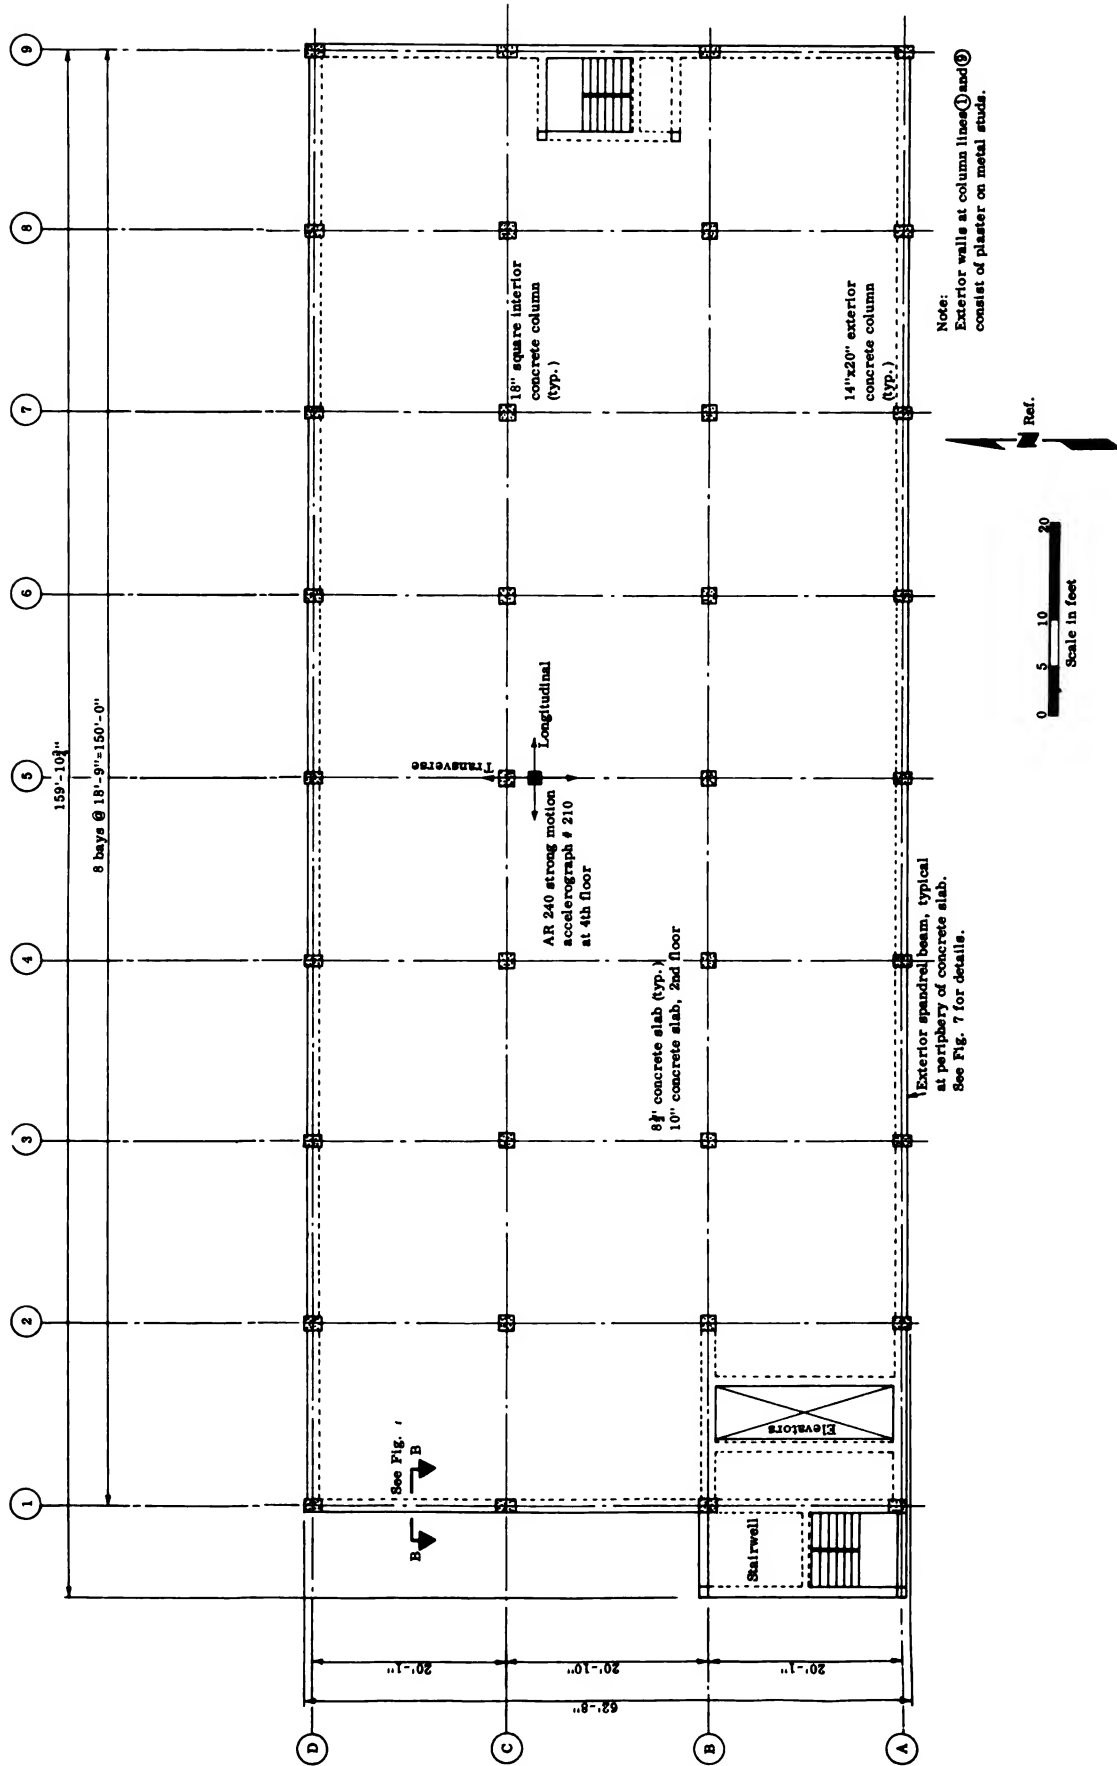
Holiday Inn, Orion Avenue. Typical floor framing plan.
